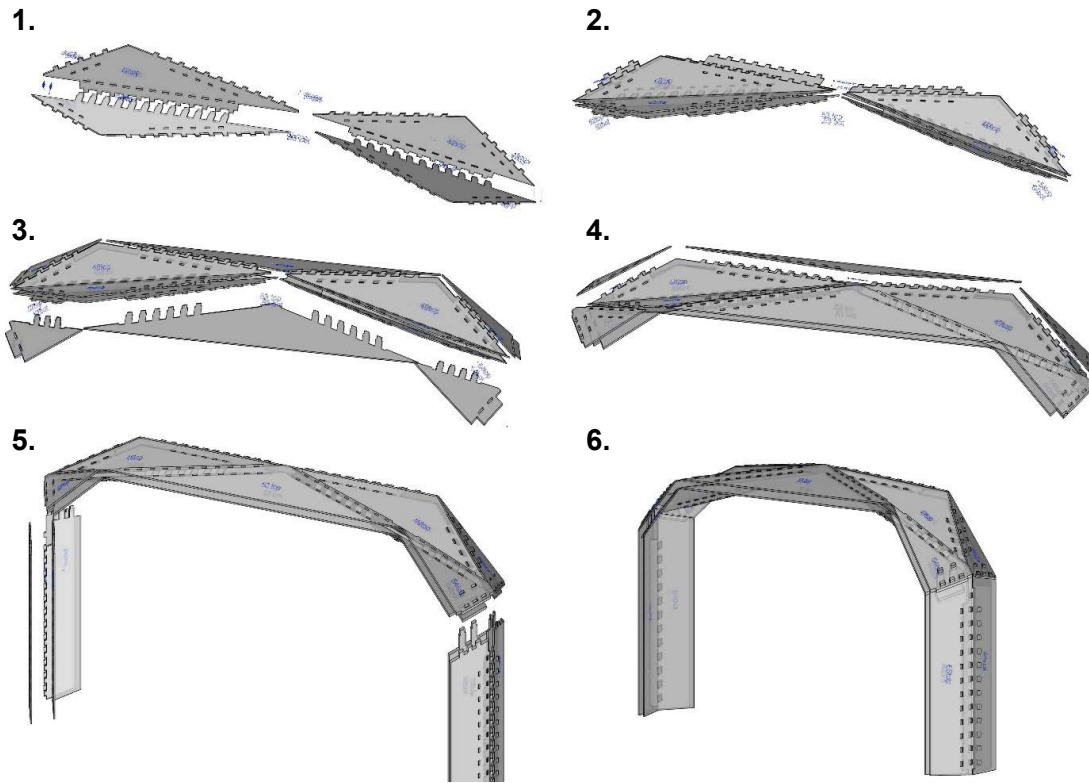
Assembly process of a building segment. Steps 1 to 4: prefabrication process of the roof element. Steps 5 to 6: onsite assembly of the wall and roof elements to obtain a complete building segment.
